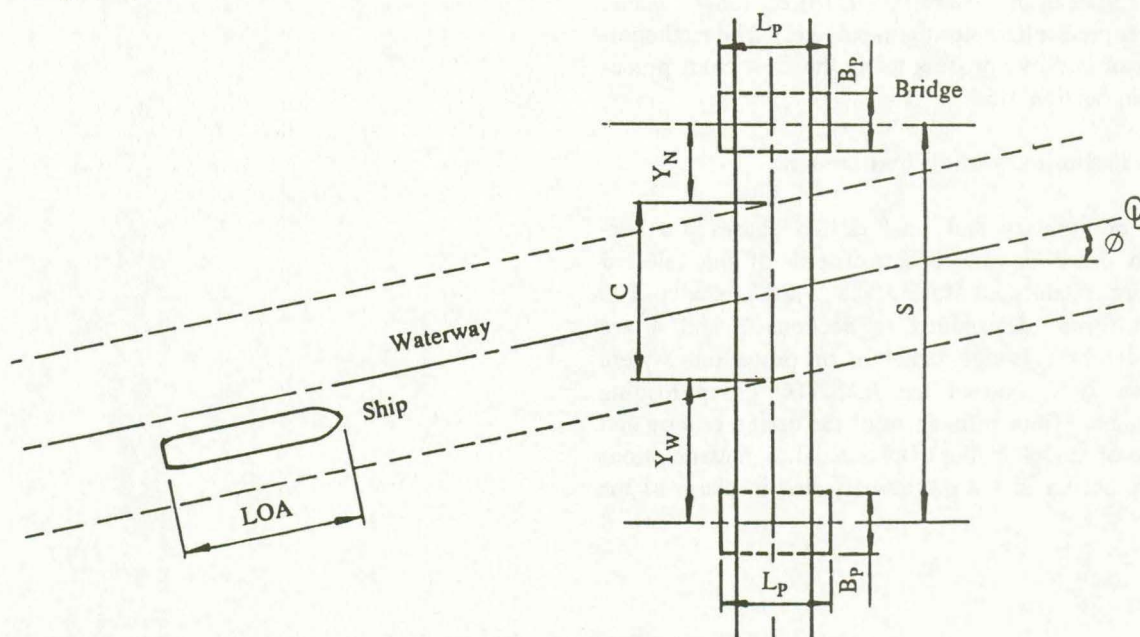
Bridge/Waterway Planning Geometry.
